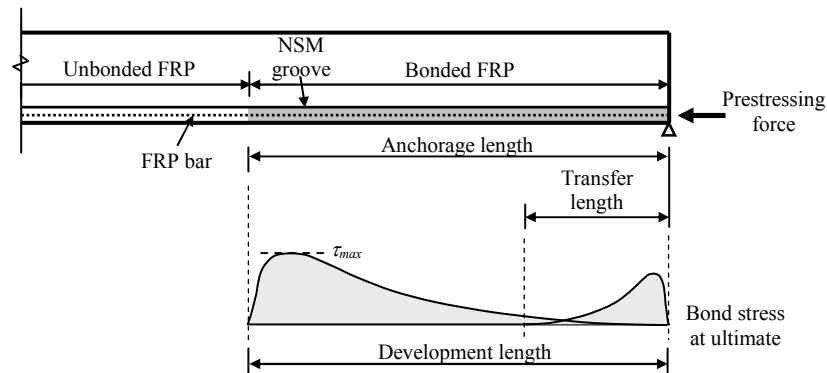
Anchorage length of partially bonded prestressed strengthened beam
